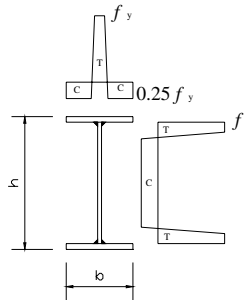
Residual stresses in an IPE welded section: C – compression; T – tension.
